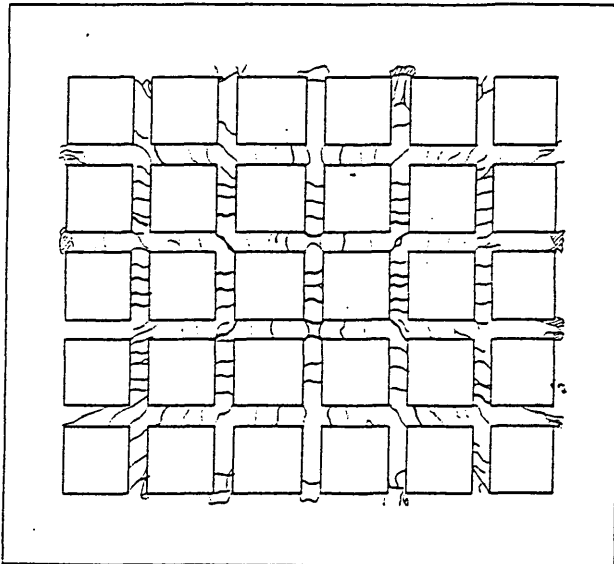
Failure Crack Pattern of R.C.Waffle Model Slab B3
